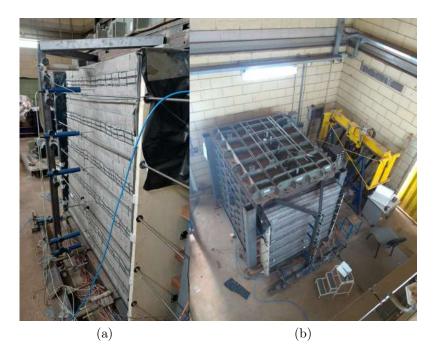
Displacement transducers support during wall surcharging: (a) side view, with detail of the fixation to the front support beam (b) top view.
